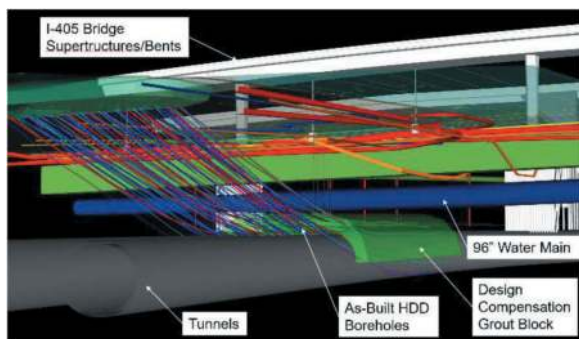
Navisworks as-built model of compensation grouting beneath 96-inch water main.
